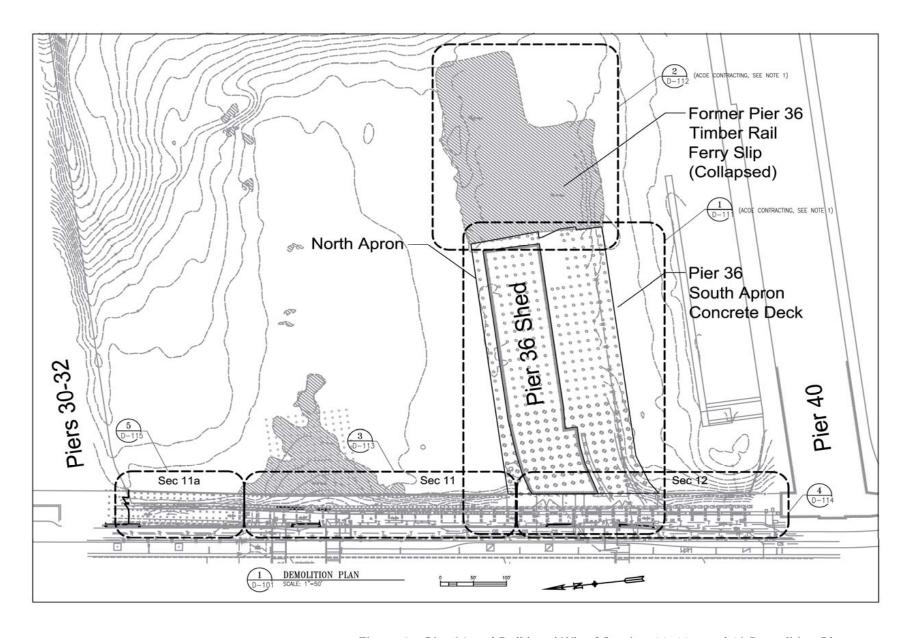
Pier 36 and Bulkhead Wharf Section 11, 11a, and 12 Demolition Plan
